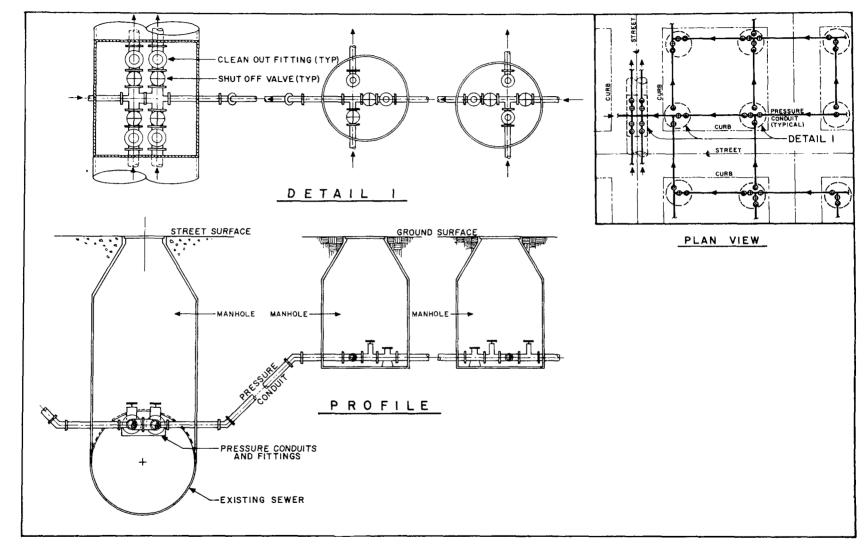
ASCE COMBINED SEWER SEPARATION PROJECT TYPICAL PIPING LAYOUT
